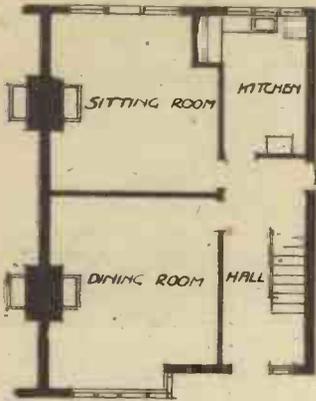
A typical pre-war ground plan of a 6-roomed house.
